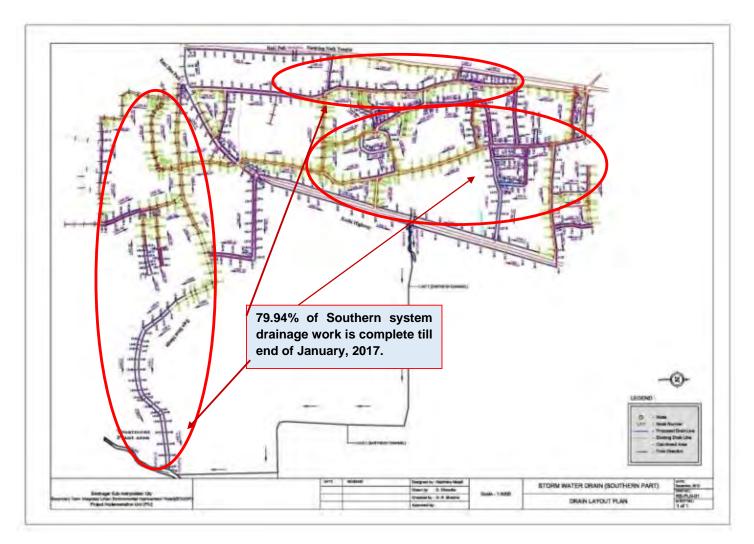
Proposed Storm Water Drains in BSMC (Southern Drainage System)
